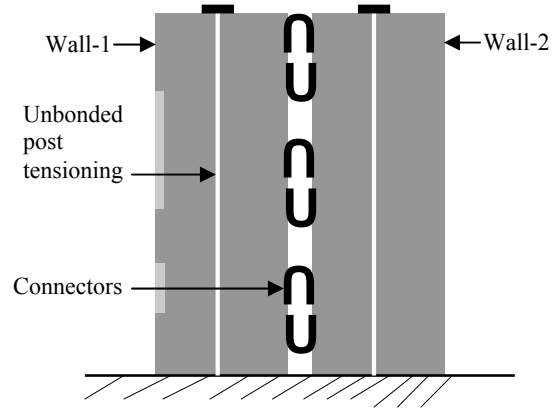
Illustration of an unbonded post tensioning jointed wall system
